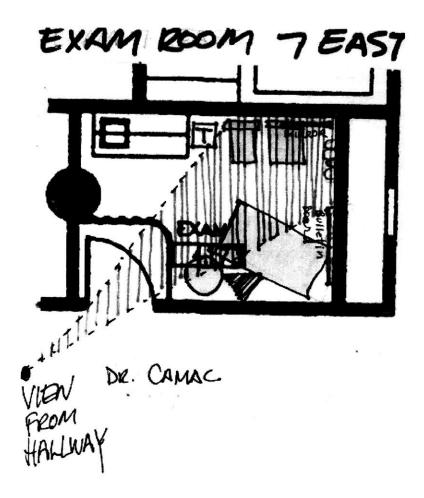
Drawing of exam room #7 east. Focus of drawing is furniture layout and view corridor. View corridor is not a desired quality.
